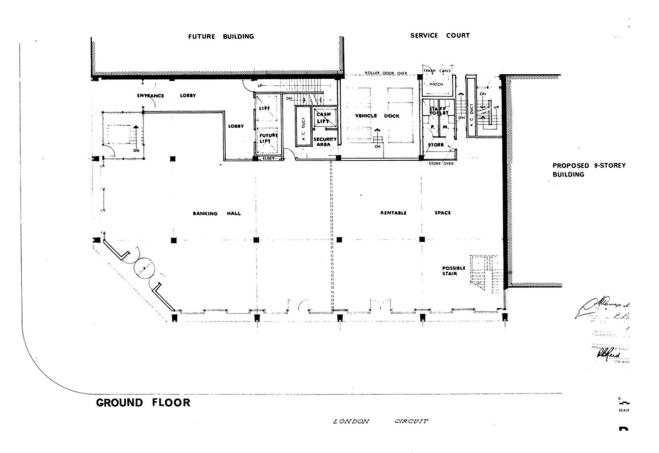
Former Commonwealth Bank Building, original ground floor plan
